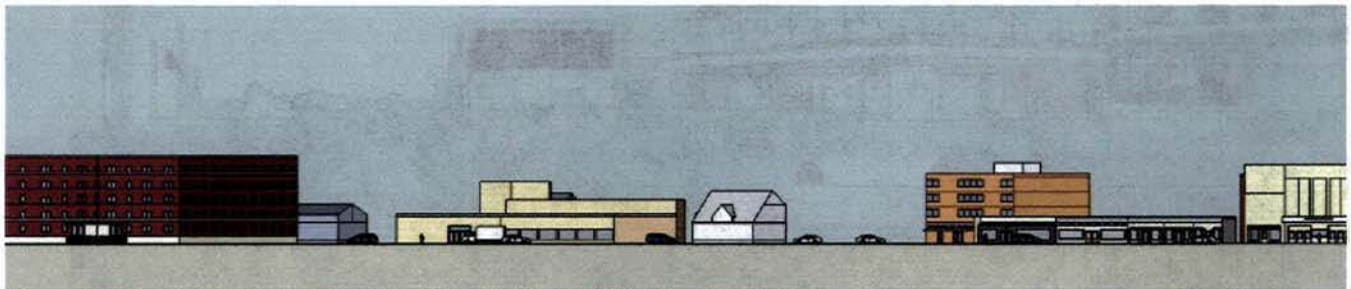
West Elevation – Cleveland Park Existing Neighborhood Context.
